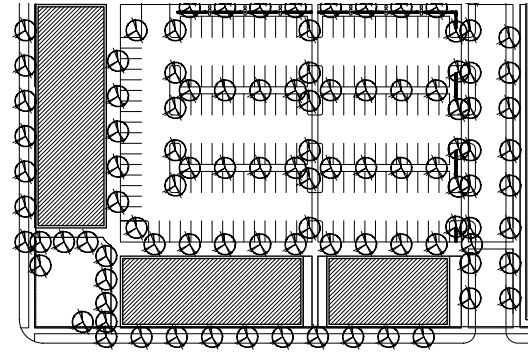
S1: Parking is located behind the buildings and accessed from the lower classified street.
